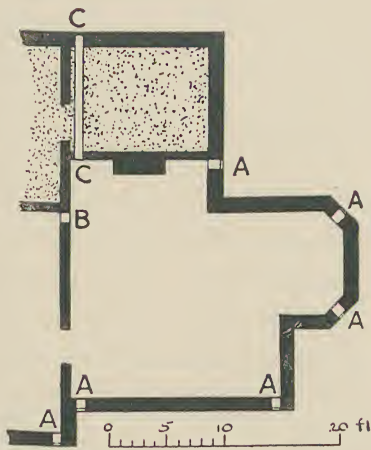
Plan showing Ventilation of Space under Wood Floor.
